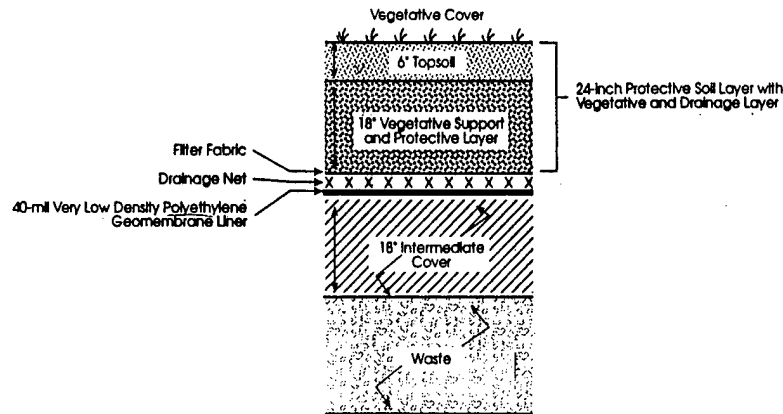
Typical landfill final cover system (Source: 14, p. 2-29, Fig. 2-10).
